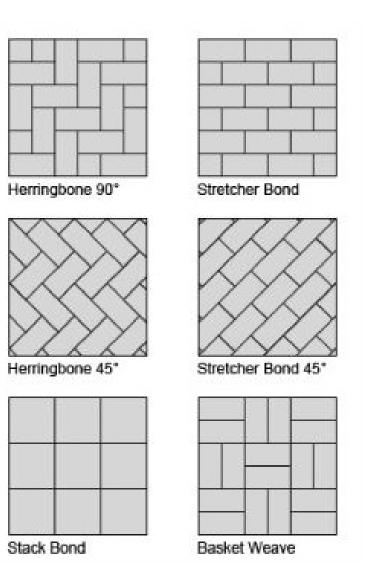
Block Layouts (Pacific Brick Paving, 2020)
